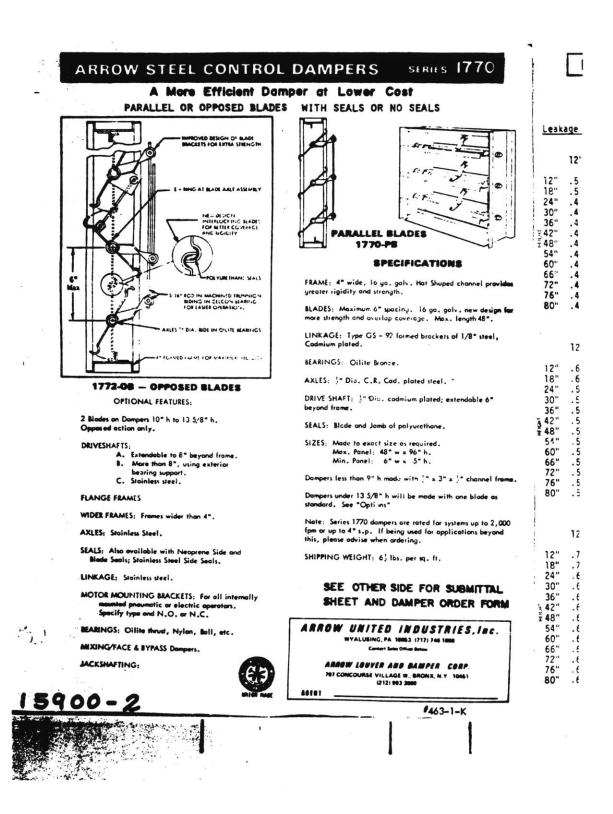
Mixing Box Damper Blade Pictorial (Arrow Steel Dampers - Series 1770)
